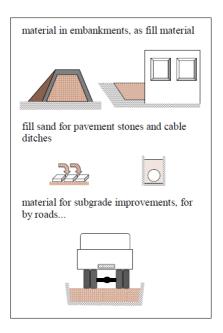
Examples for the application of clay masonry construction and demolition waste in unbound systems (source: Mueller and Stark, 2002)
